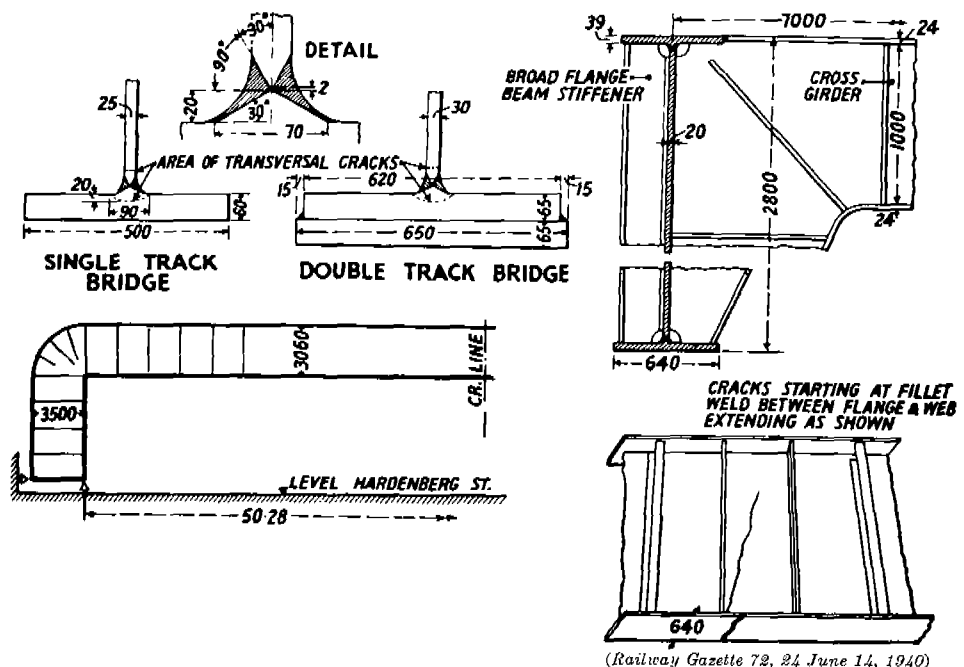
Details of welded bridge failures. Left, at Zoological Gardens Station, and right, at Rudersdorf⁴²
